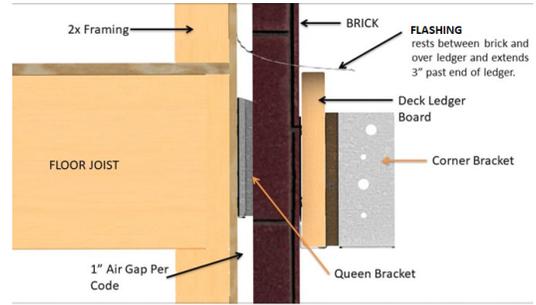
OVERALL INSTALLATION AND FLASHING DETAIL
